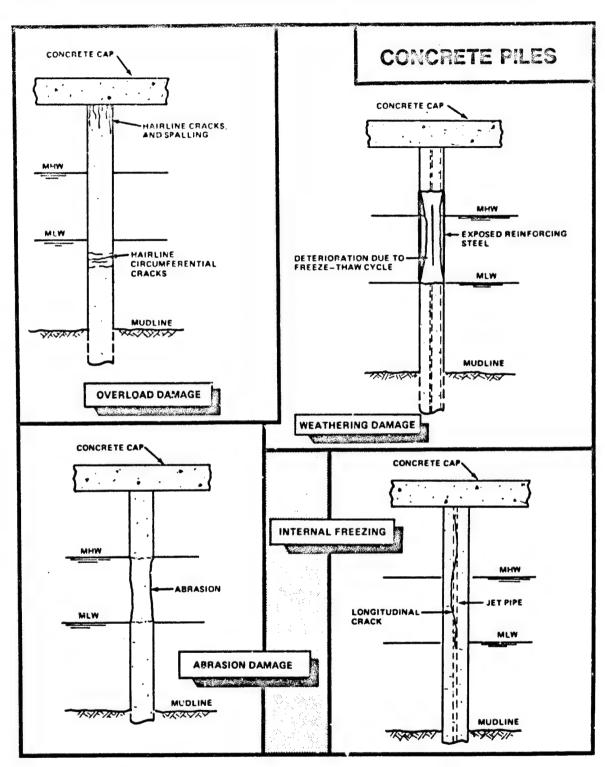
Typical Damage to Concrete Piles from Weathering, Freezing, Abrasion, and Overloading.
